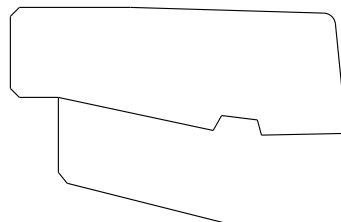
Ex Curb Sec 10.5 Cell (Barriers and Rails Library)
